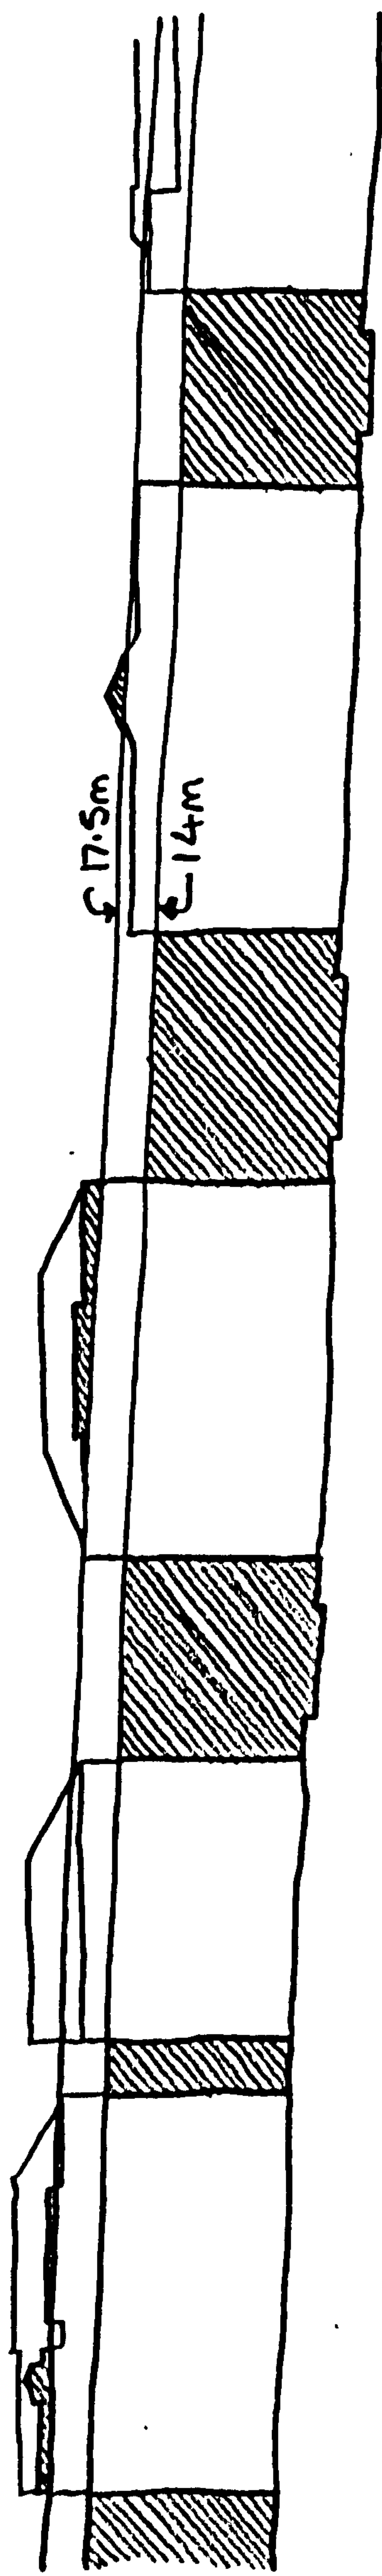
BUILDING HEIGHT ANALYSIS : GREY STREET · EAST SIDE
